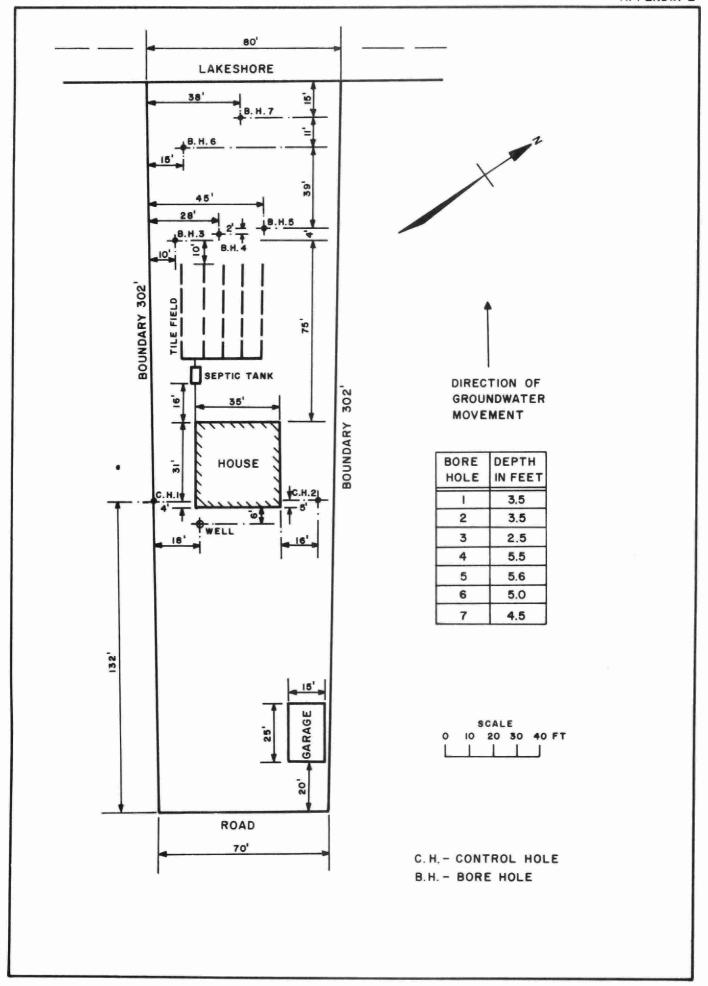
TRACER STUDY SITE PLAN EST. B-I LITTLE LAKE
